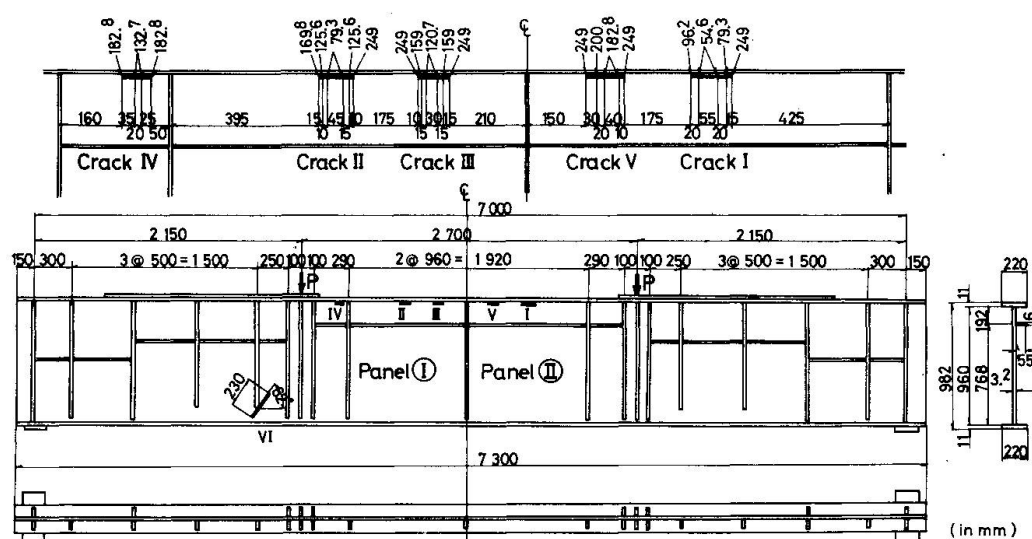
Overall View and Fatigue Cracks of Girder F-5.
